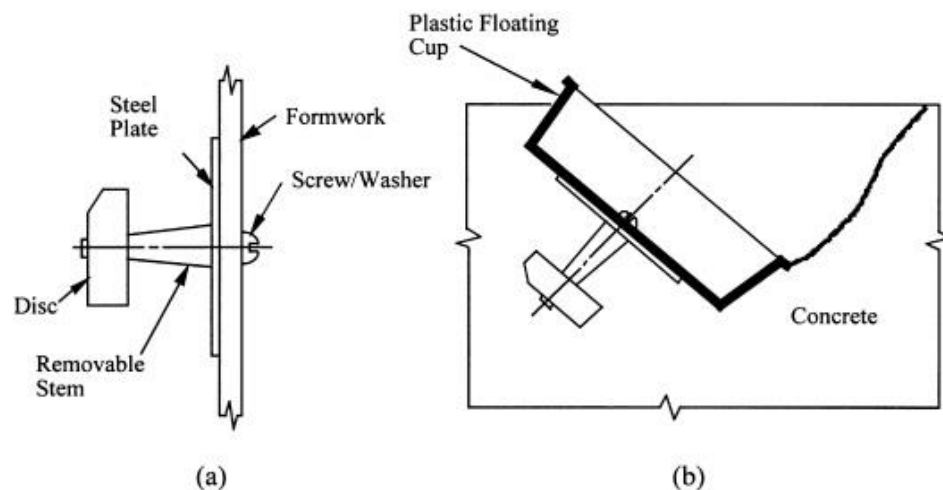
LOK test inserts and pull-out arrangement used: (a) formwork type and (b) floating type (Long, Henderson and Montgomery, 2001)
